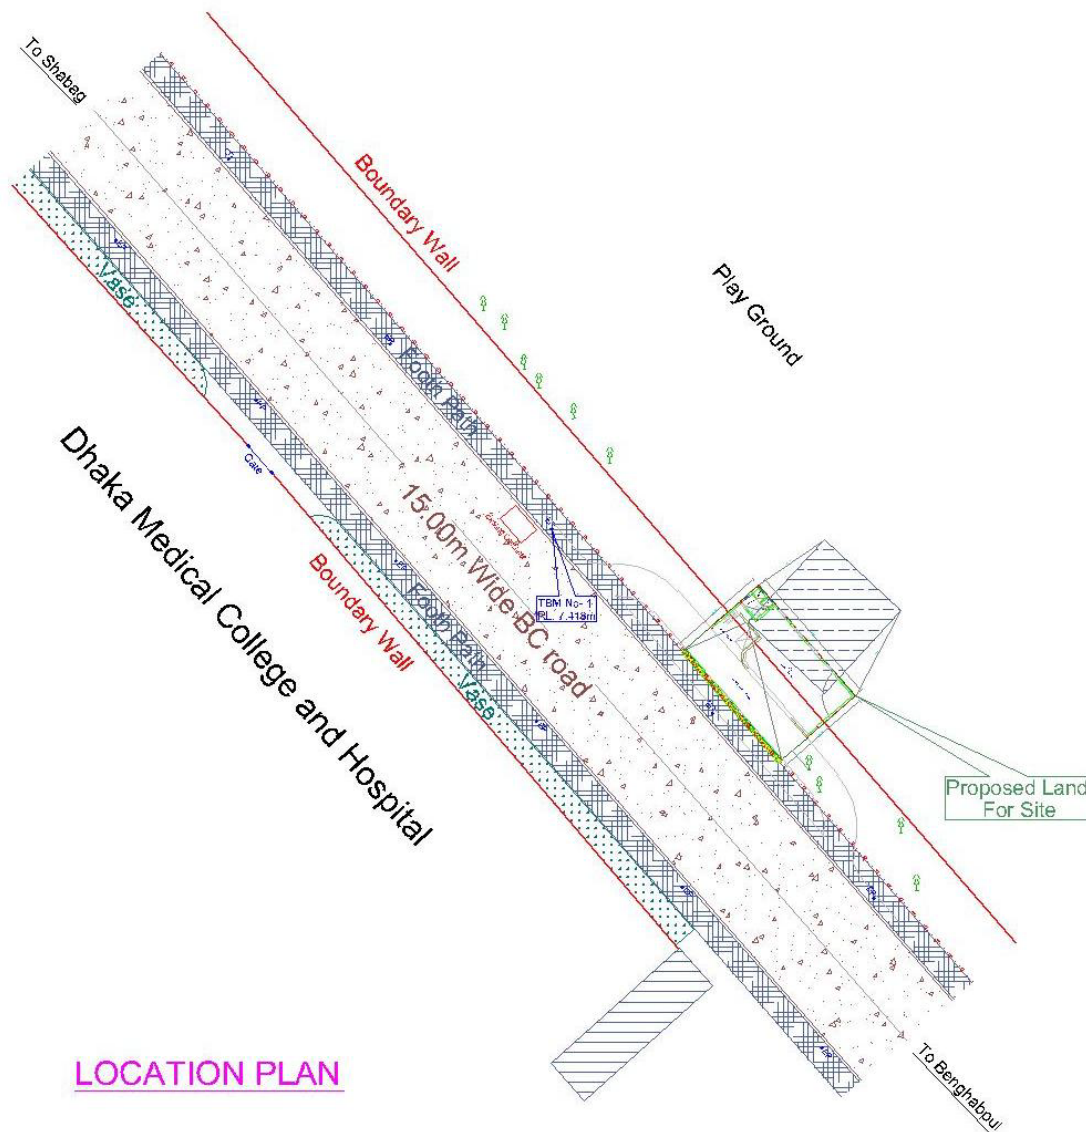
STS – 12 DMC Dhaka University Playground Layout Plan (23°43'35"N, 90°23'55"E)
